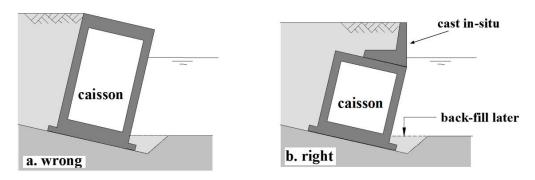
Construction error in the positioning of a quay wall-caisson (exaggerated)
